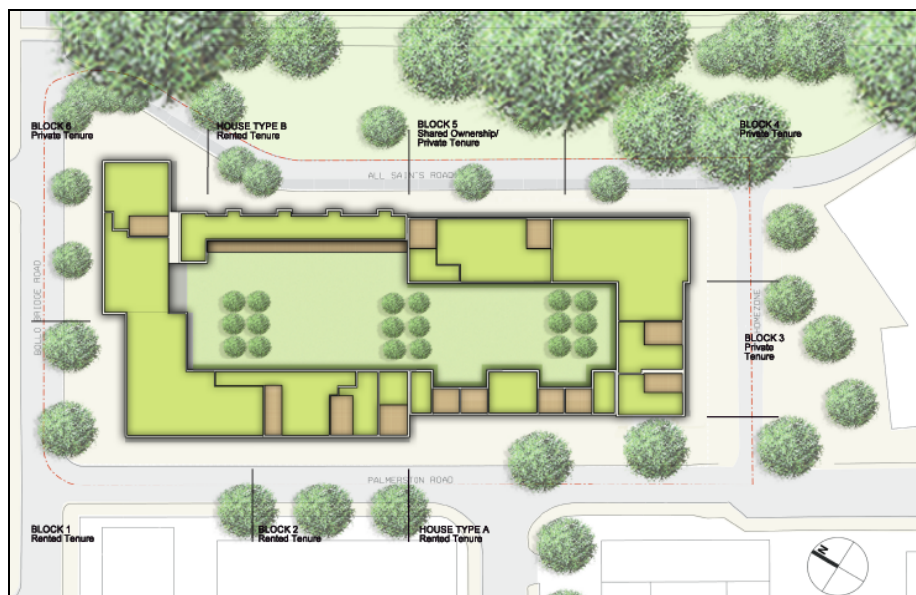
Site layout plan (source: submitted Design and Access Statement)
